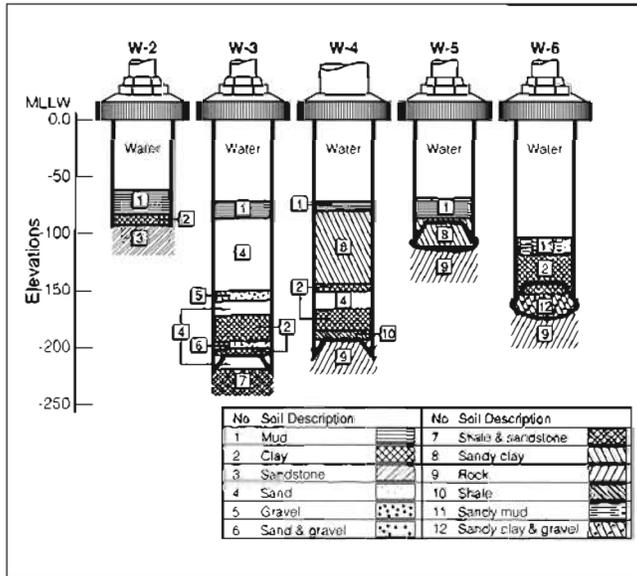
Soil conditions under West Bay Crossing at Pier locations W-2 through W-6
